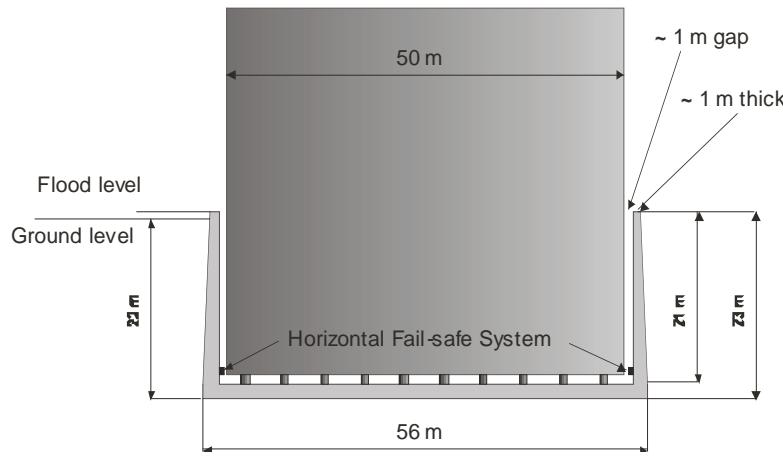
Sketch of the isolation system layout under the IRIS NSSS building
